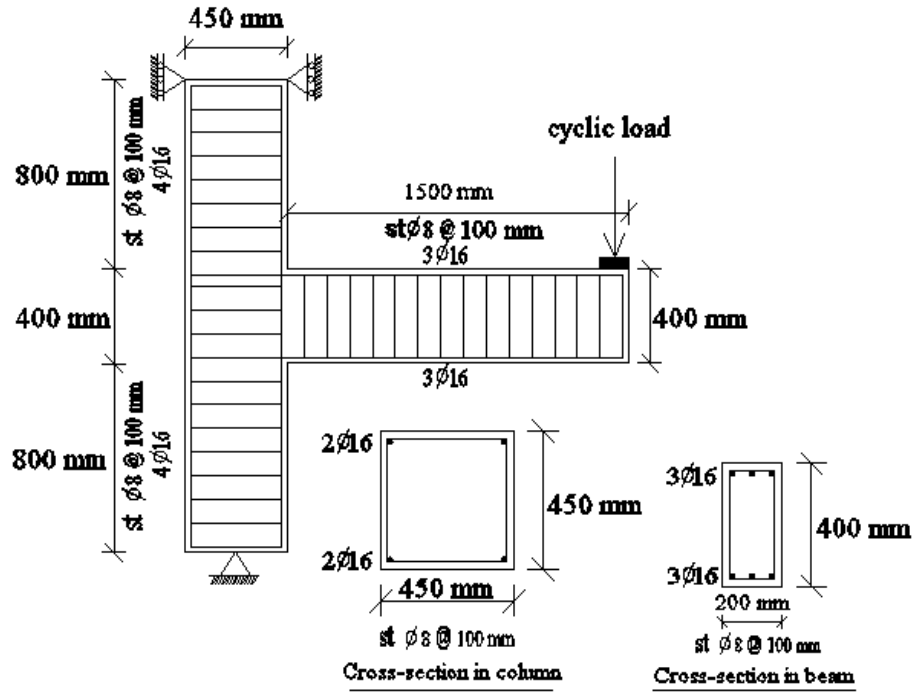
Dimensions and Boundary Conditions of Study Connections
